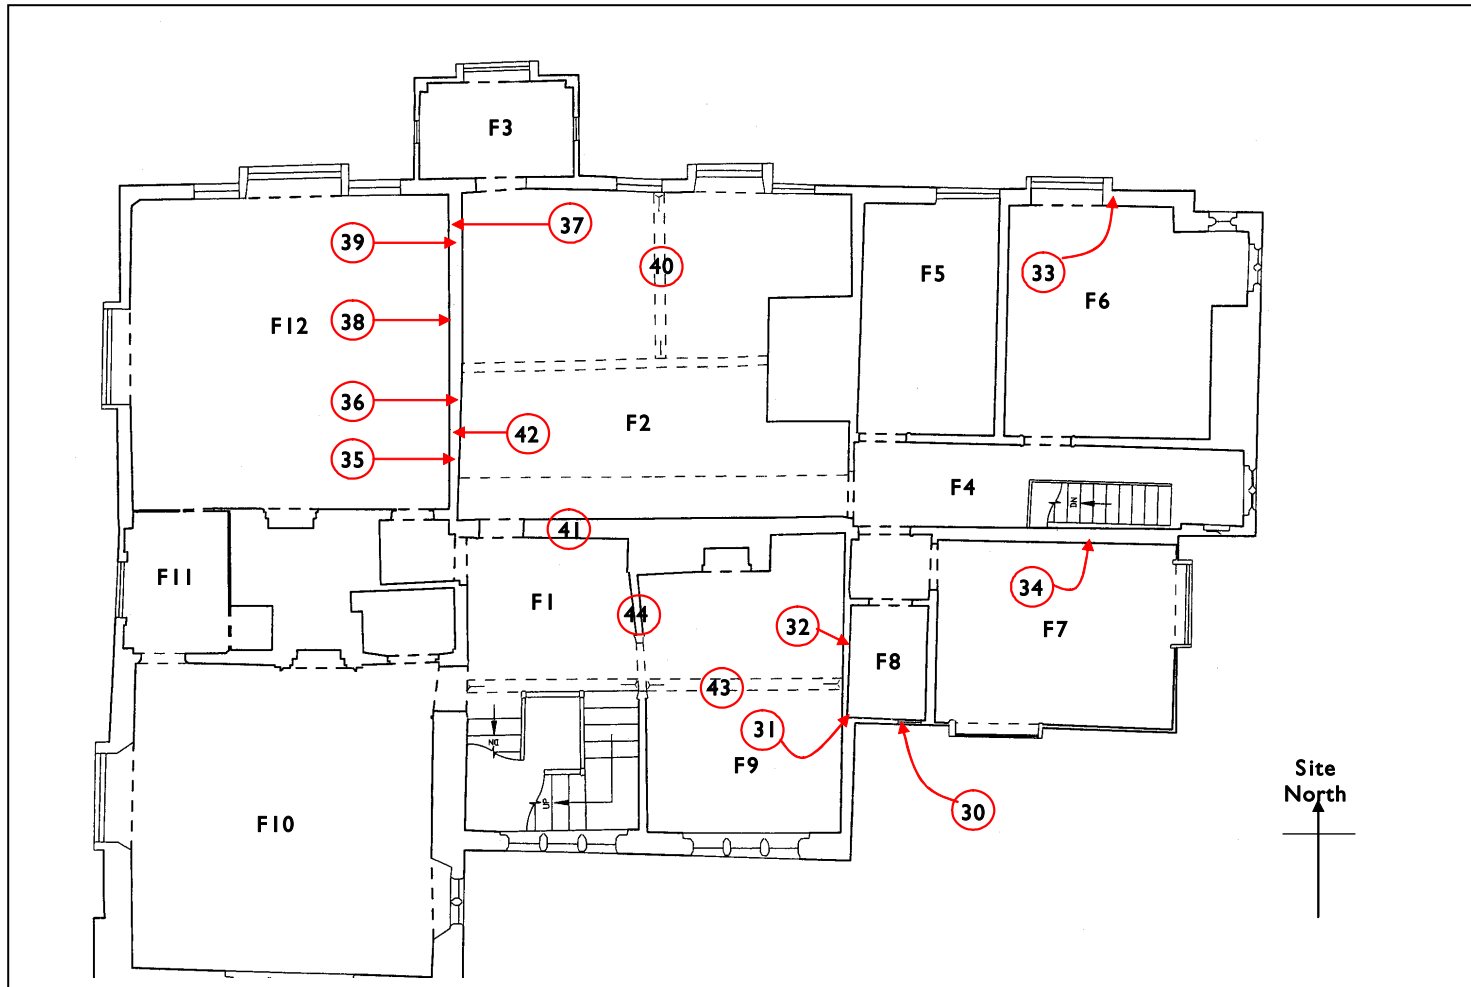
First-floor plan to show position of sampled timbers (after Birmingham Archaeology)
